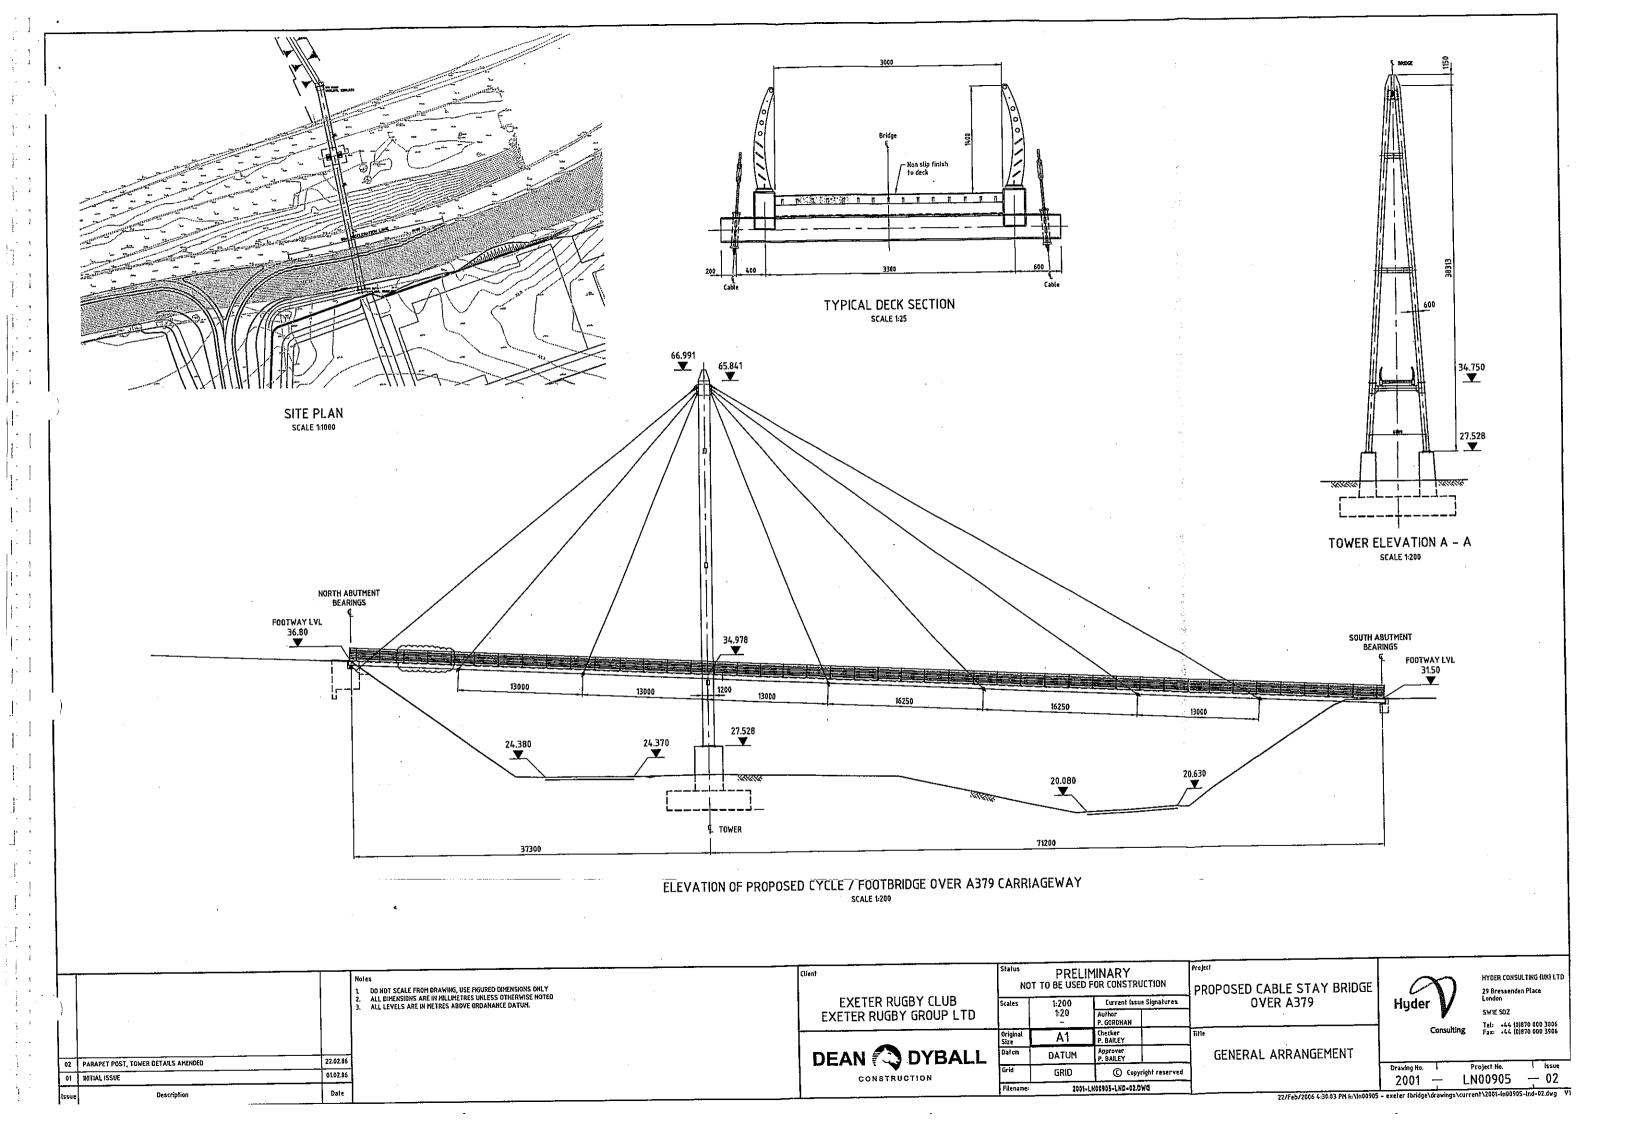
PL 23 - Proposed Cablestay Bridge Over A379
